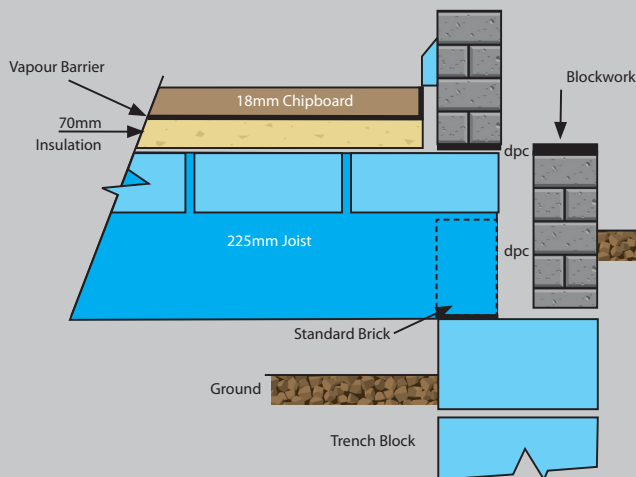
TYPICAL SECTION 225mm DEEP JOIST
